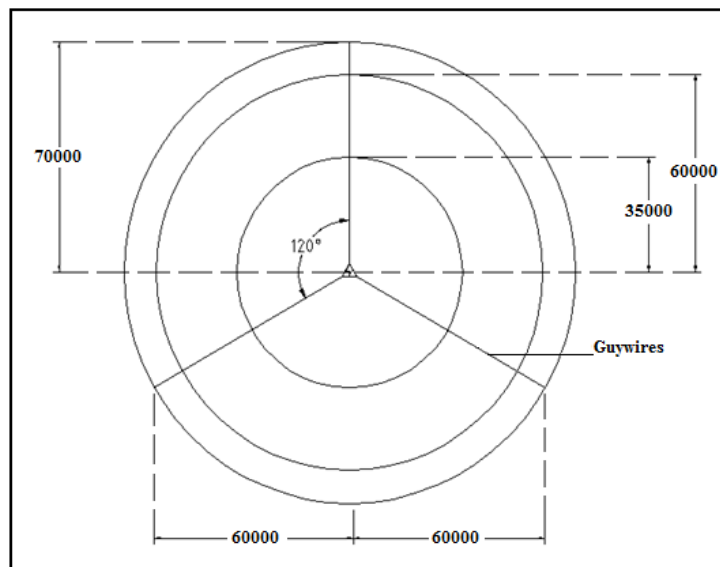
Plan view showing location of guy wires of 81 m FRP tower (units in mm)
